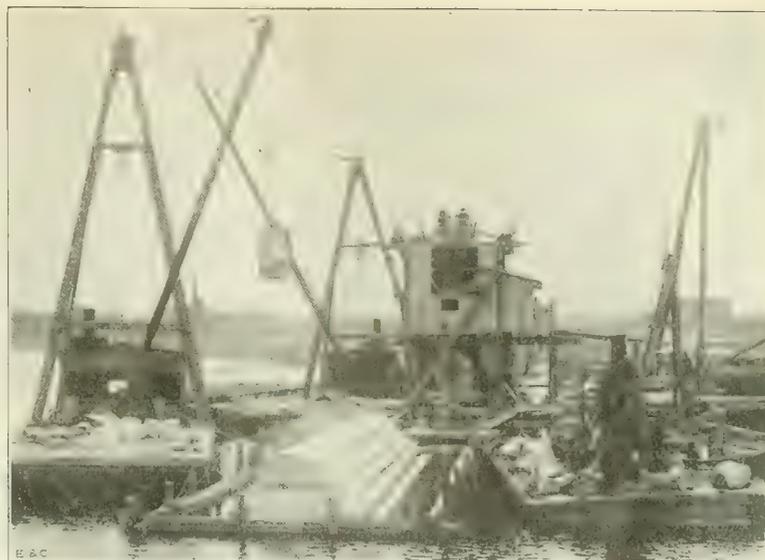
View of Completed Pier of Larz Anderson Bridge and of Concrete Mixing and Placing Equipment.
